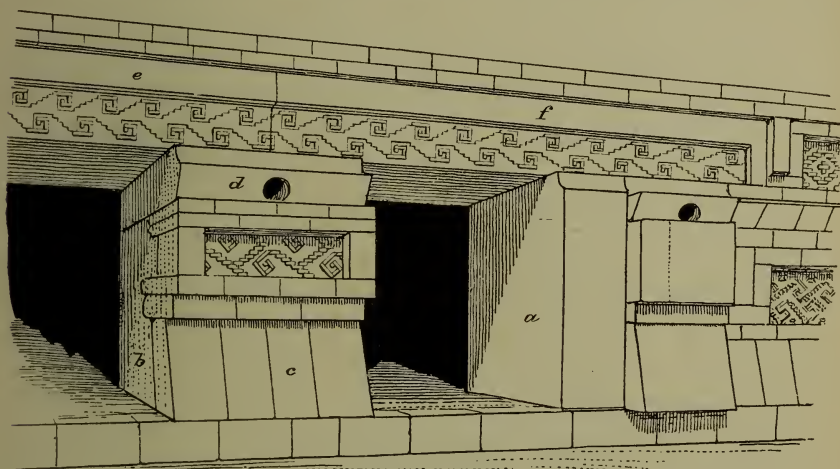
CONSTRUCTION OF TRIPLE DOORWAY, ONE-HALF ONLY BEING SHOWN.
